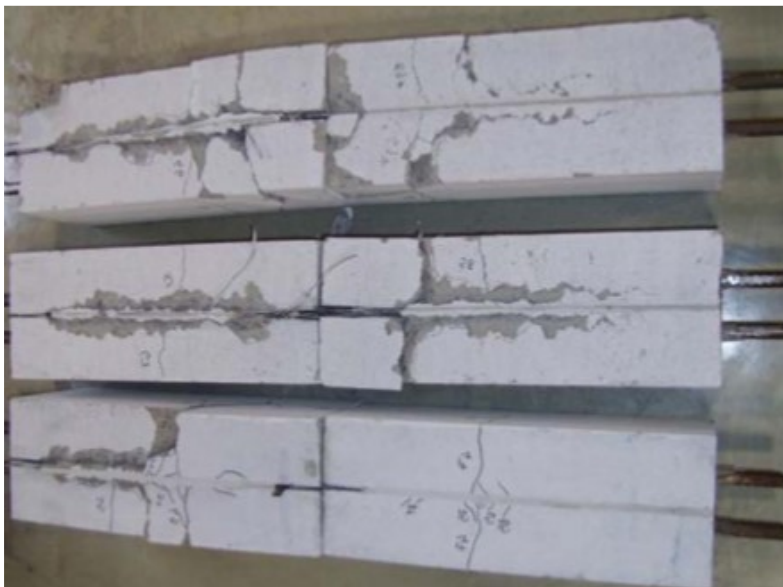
12 – Typical failures of NSM specimens with varying degrees of concrete damage (Round Robin tests - Bilotta et al, 2015)
